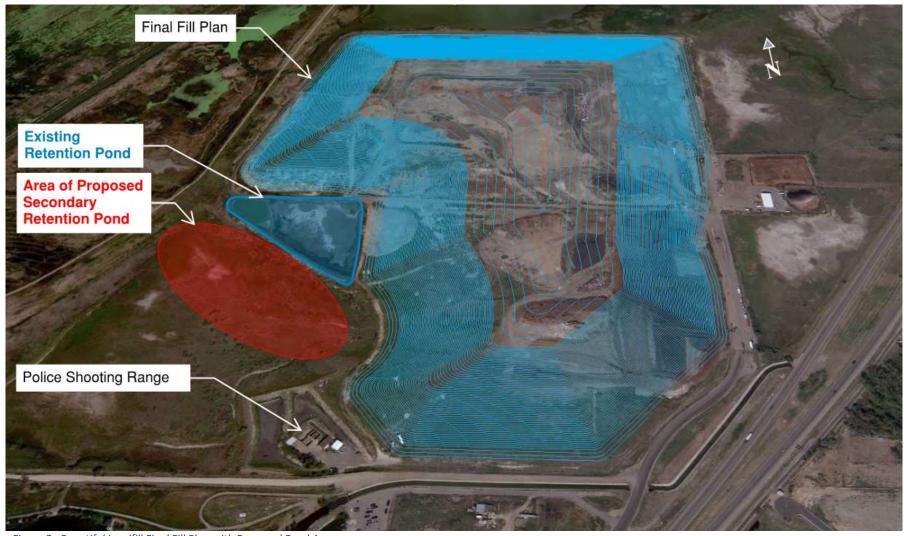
Bountiful Landfill Final Fill Plan with Proposed Pond Area
